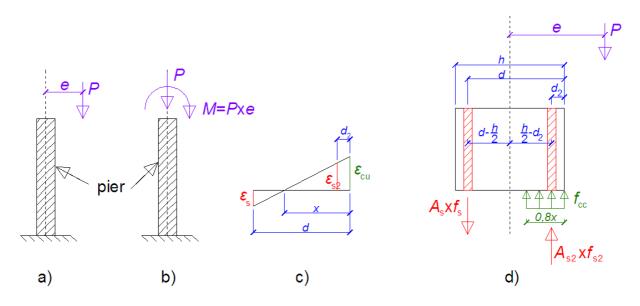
Section of a reinforced concrete pier and its external loading (adapted from Nilson & Winter, 1991)
